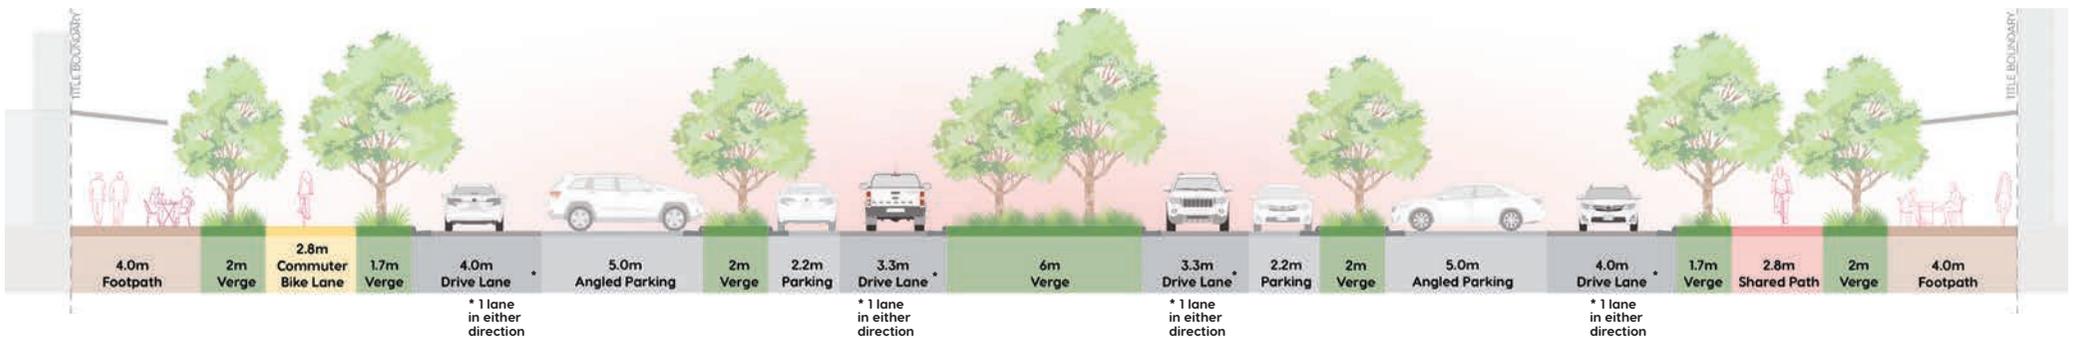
High Street typical street cross section - proposed conditions between Smith and Palmerston Streets
